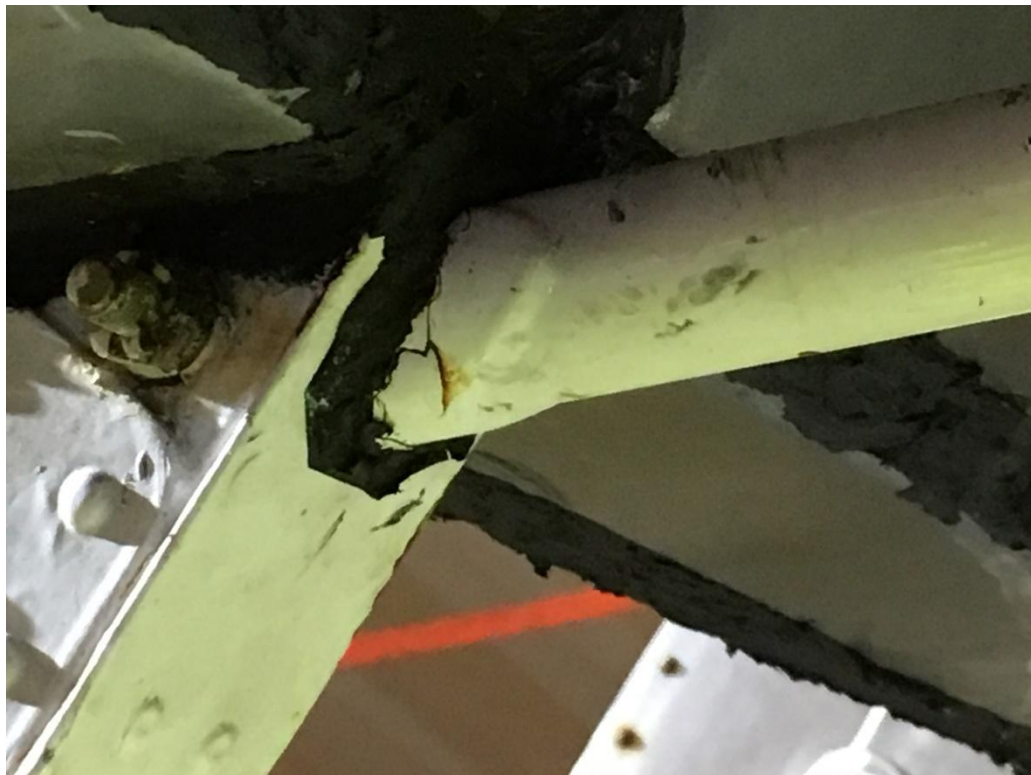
View looking under W14 – The rib is damaged and not touching the skin
